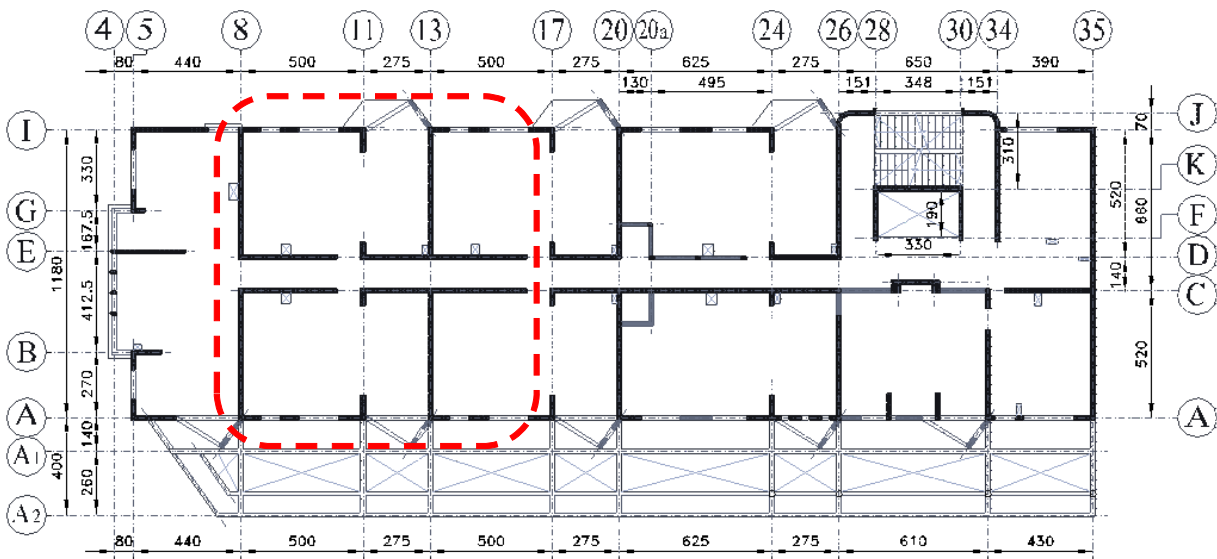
Alto Rio building second-floor plan. Dashed line encloses portion of building modeled in the nonlinear static analysis (Unit: cm) (Note: 1 cm = 0.3937 in)
